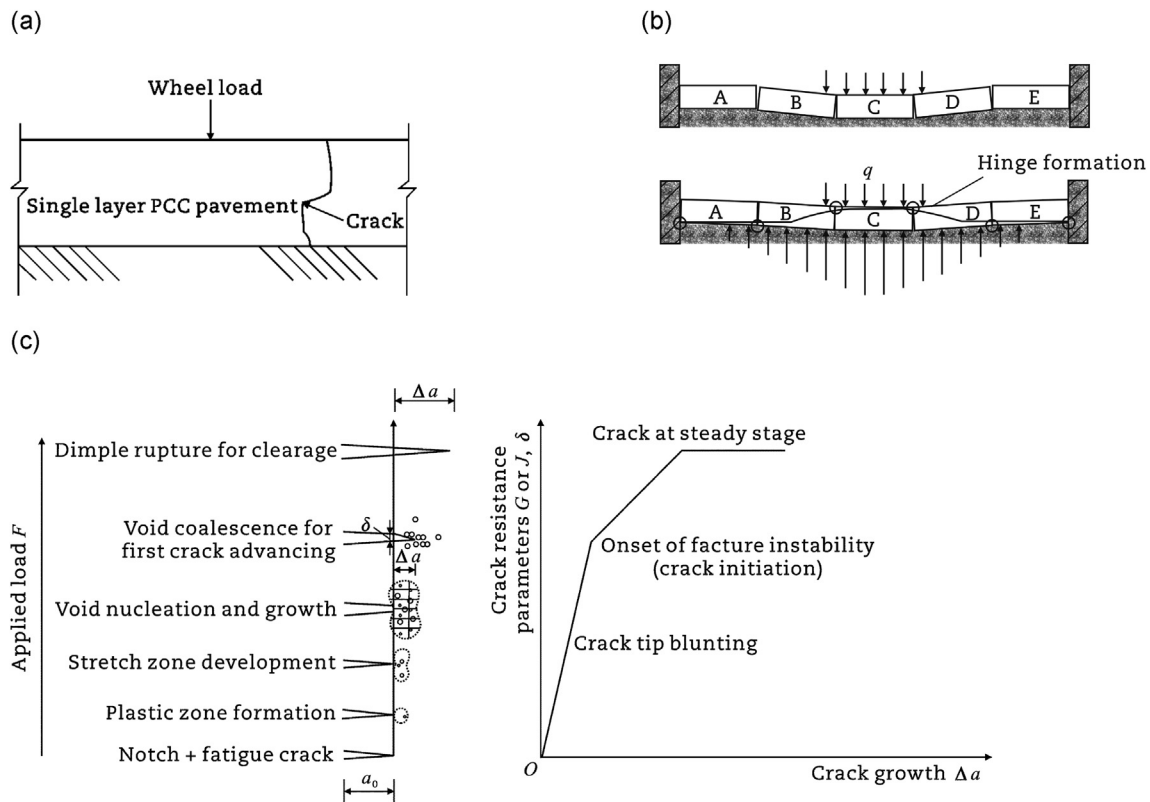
Failure modes of different pavements. (a) PCC pavement. (b) Concrete block pavement (Soutsos et al., 2011). (c) AC pavement (Tang, 2014).
